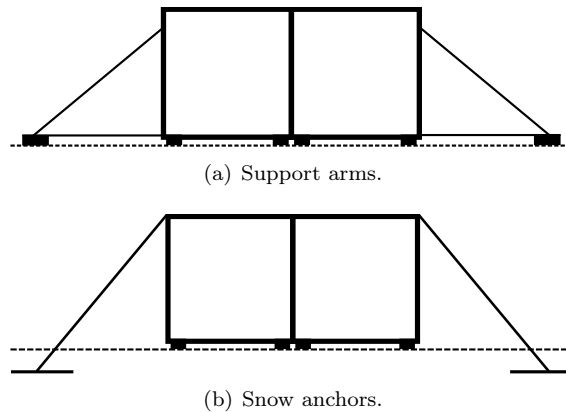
Sketched support structures. View from the short end of the container foundation.
